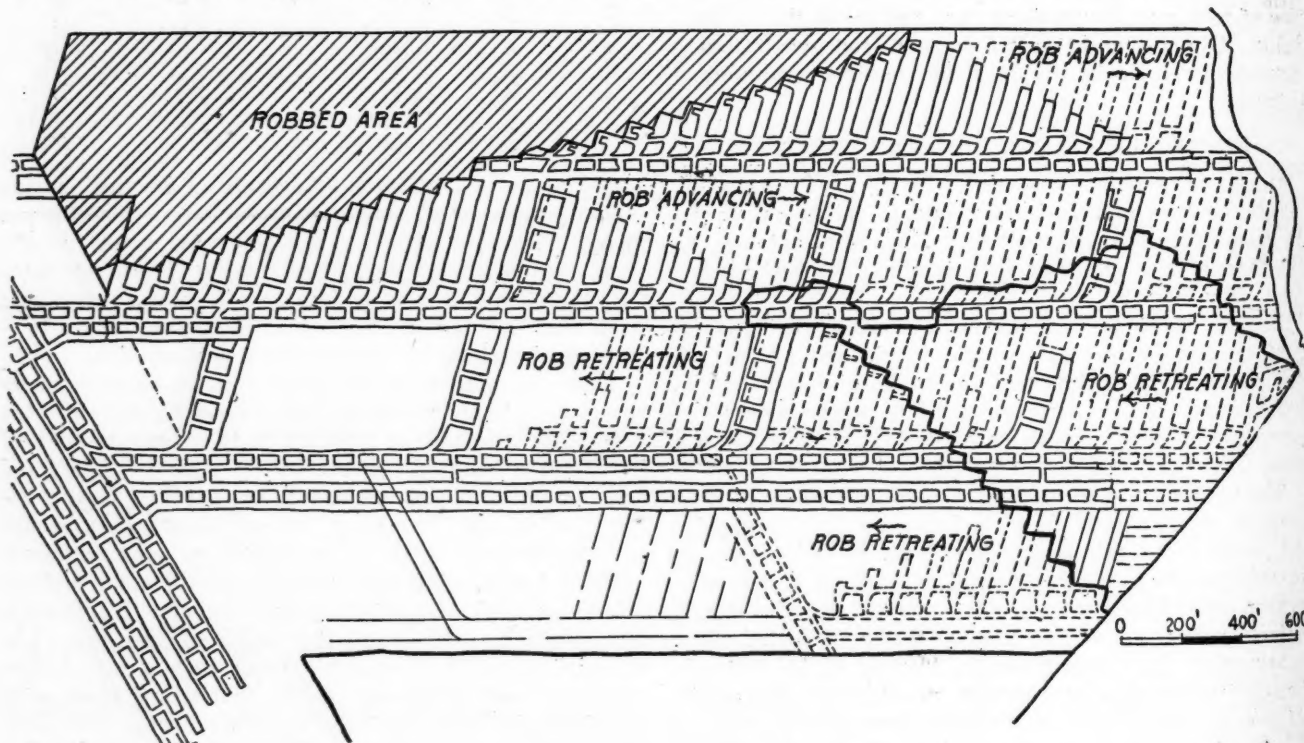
GENERAL PLAN OF MINE NO. 6, UNITED STATES COAL &amp; COKE CO.
